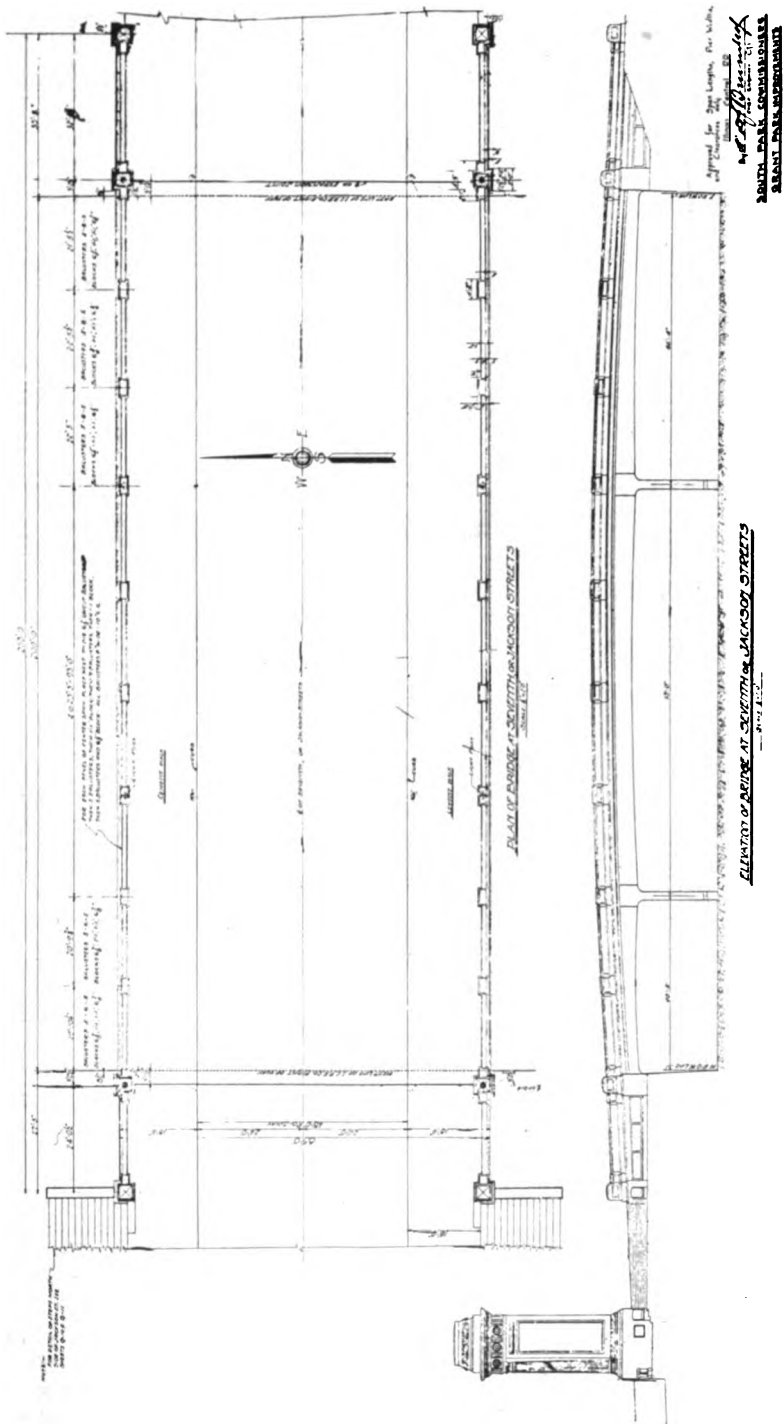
PLAN AND ELEVATION OF BRIDGES TO BE BUILT AT JACKSON BLVD., AND AT SEVENTH STREET.
